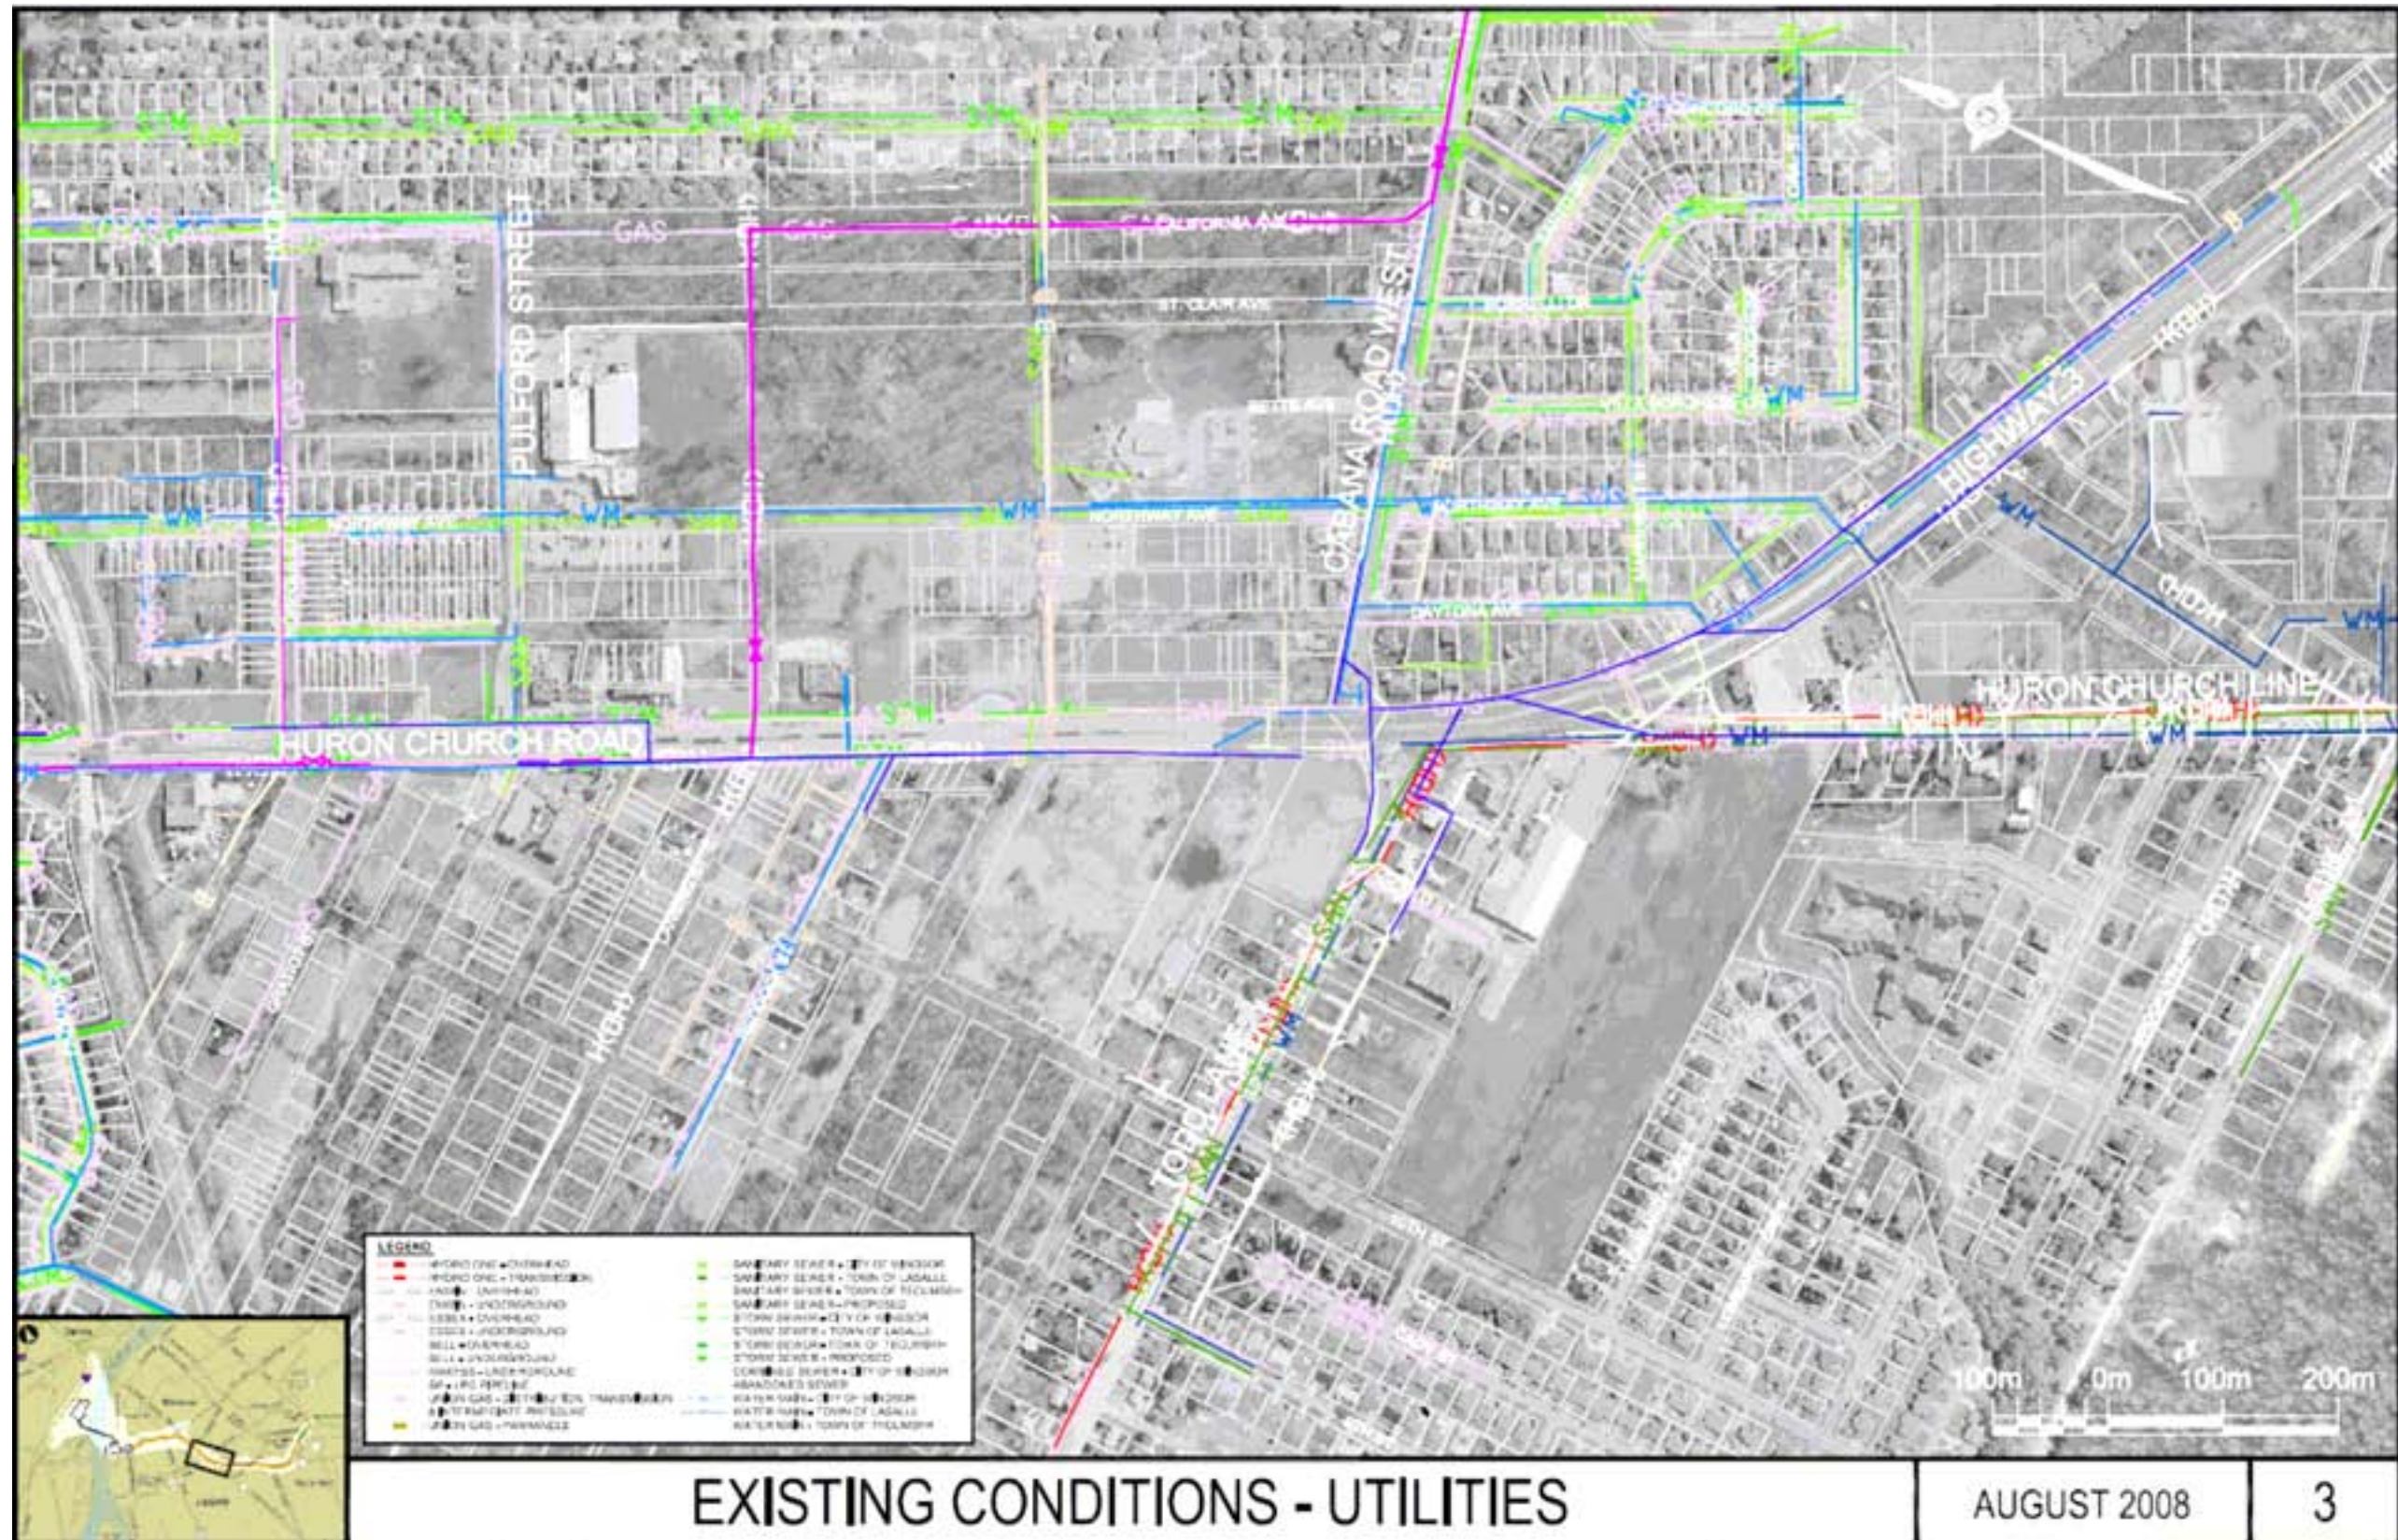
D – EXISTING UTILITY CONDITIONS (HURON CHURCH ROAD TO COUSINEAU ROAD)
